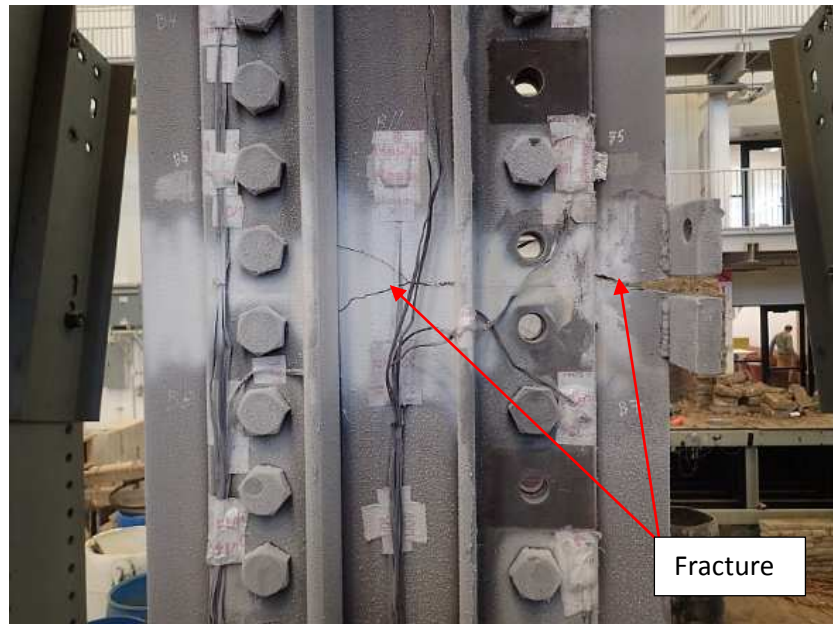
CBFR Specimen 5 following fracture of the center plate
